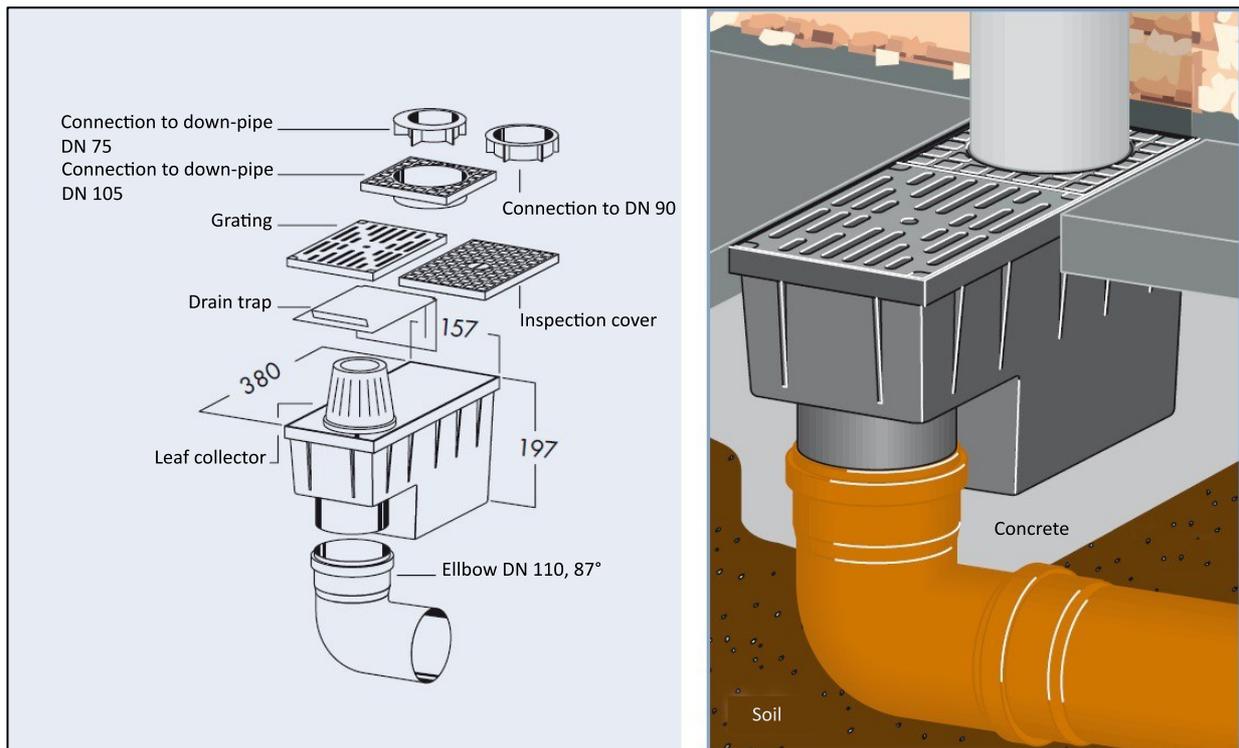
Schematic drawing of an installed rain hopper with an additional outlet for surface water⁴⁷
